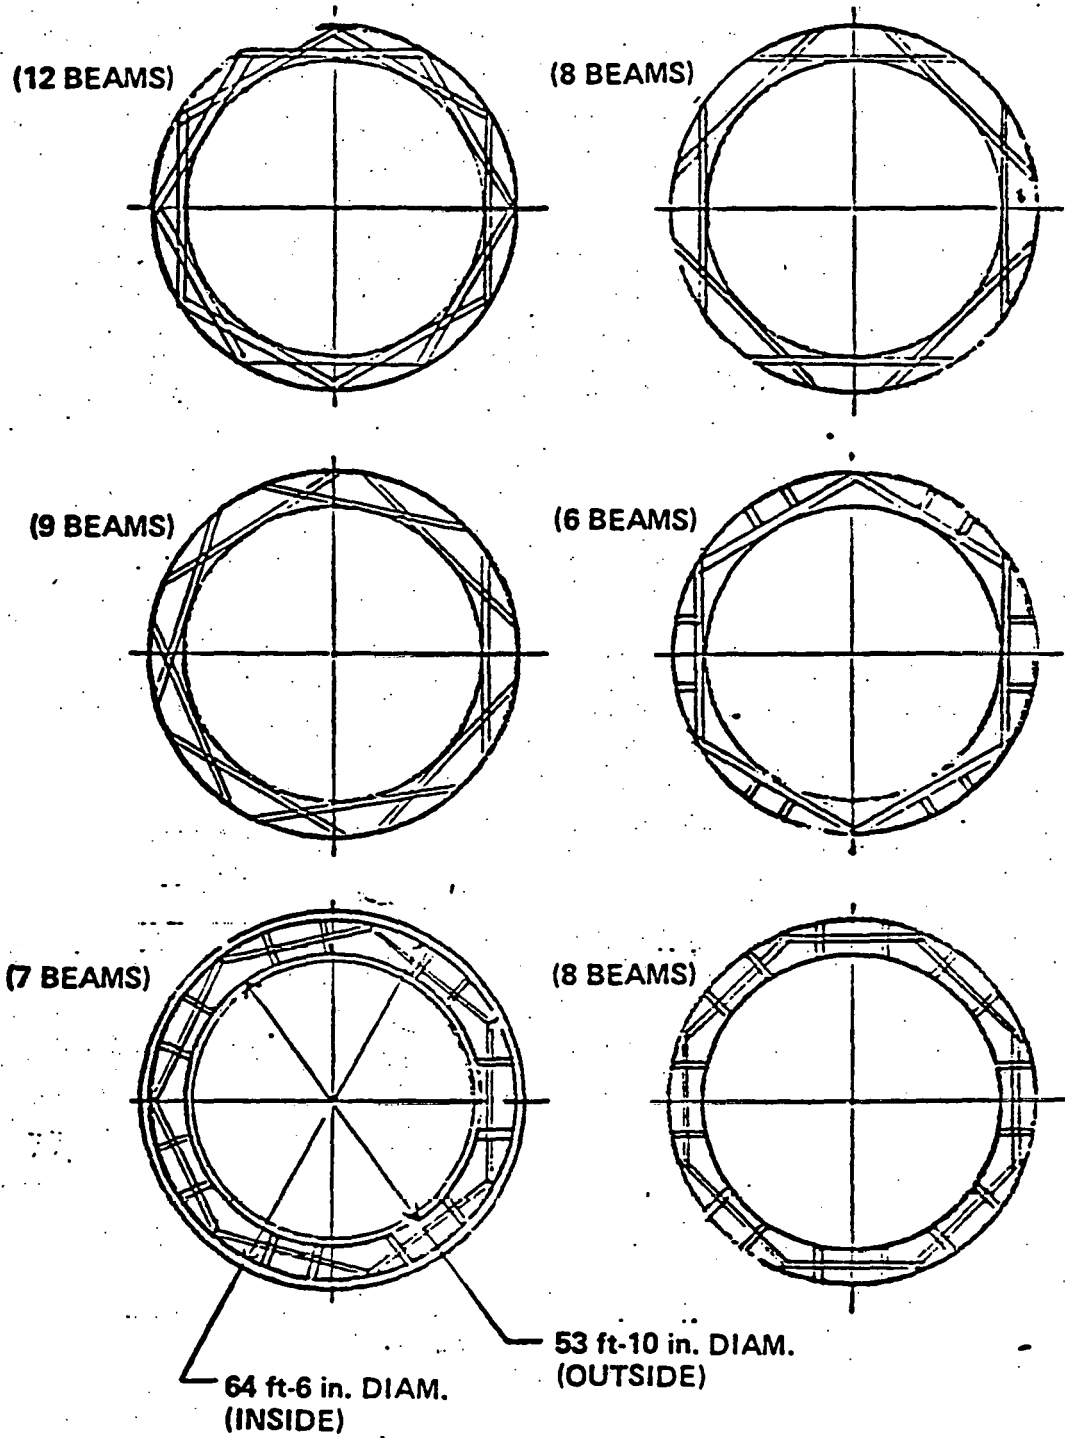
TANGENTIAL BEAM VESSEL SUPPORT STRUCTURE (PLAN VIEW)
